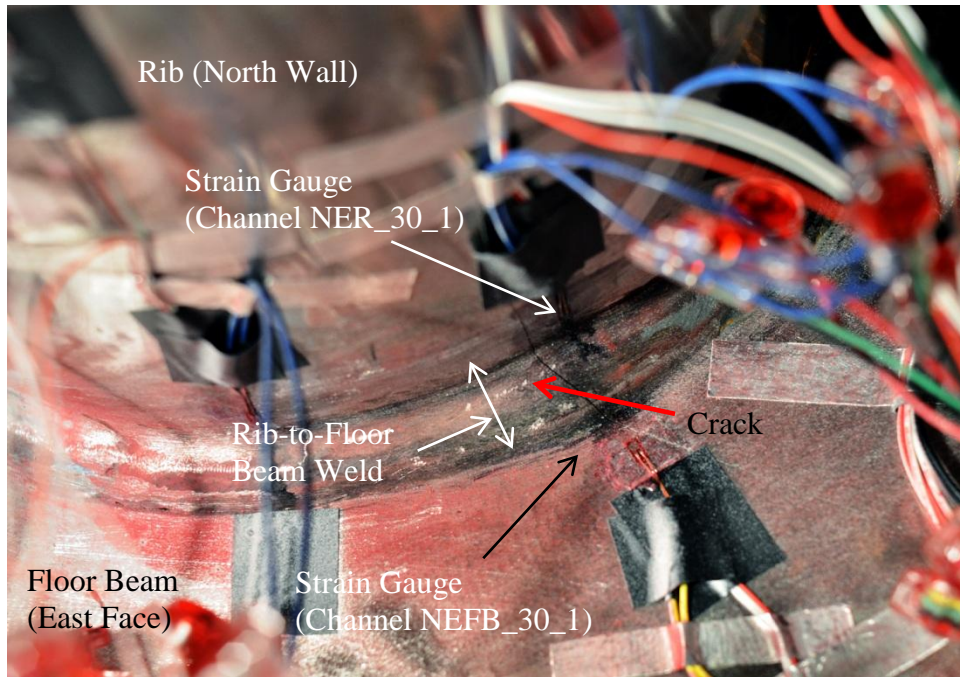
Crack at the floor beam-to-rib welded connection in the mock-up specimen MU3 – north east
